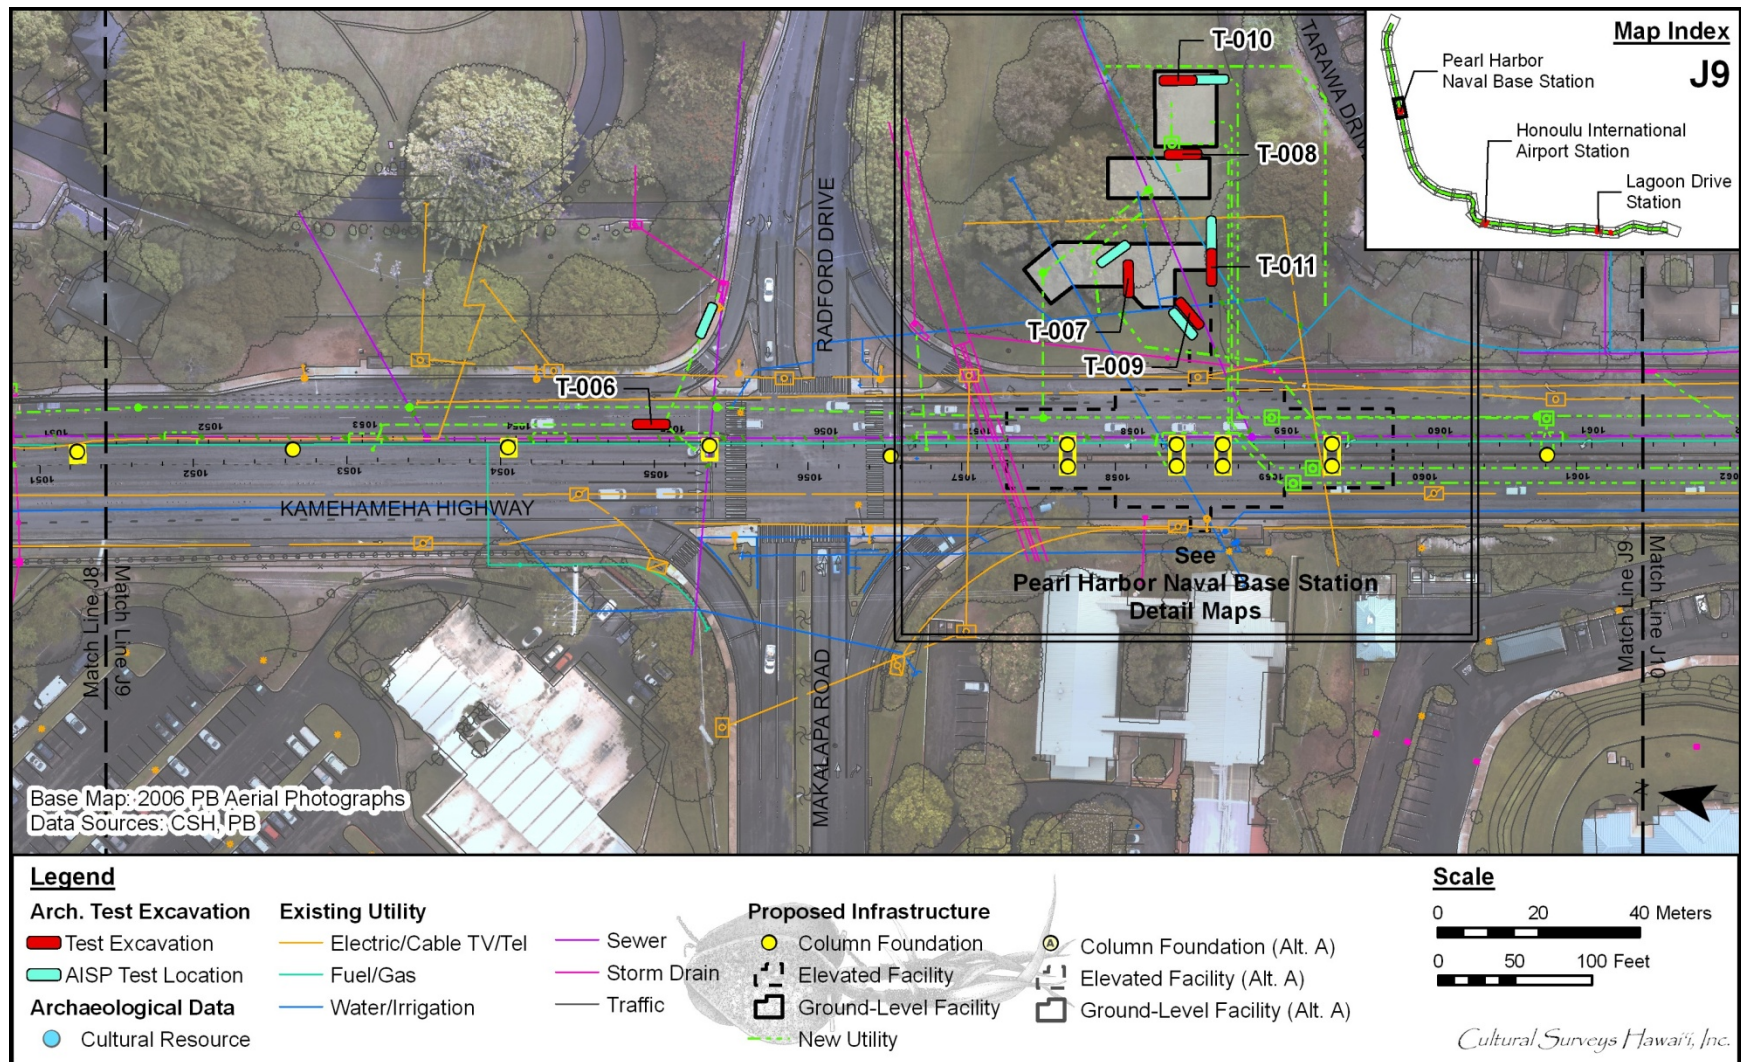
Map Sheet J9 (near Radford Drive), one test excavation (T-006) at utility relocation (24" storm drain) @ 1043+90 (see Station testing layout on following figure)
